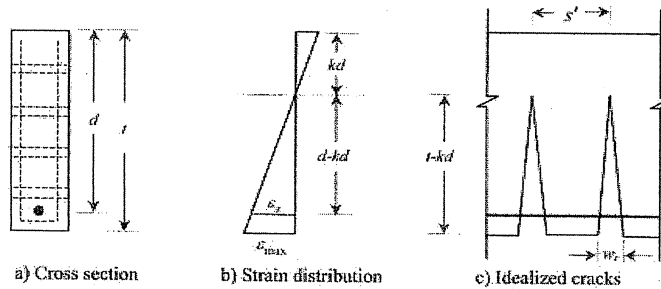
Flexural Cracking of a Masonry Beam
